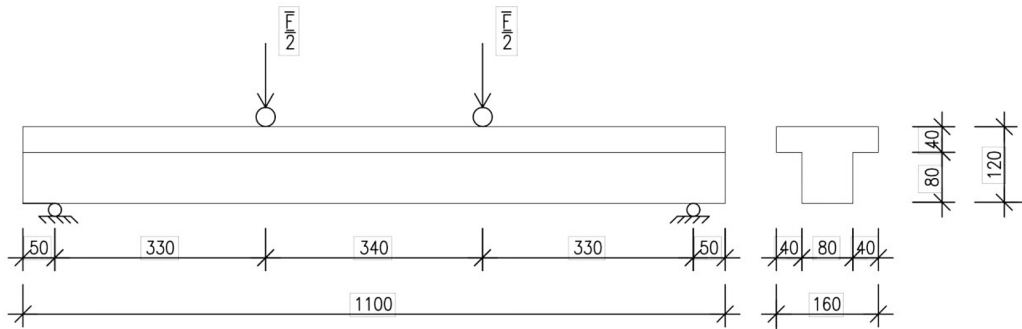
Diagram of a beam on a test bench under temporary load with a cross-section (T-section)
